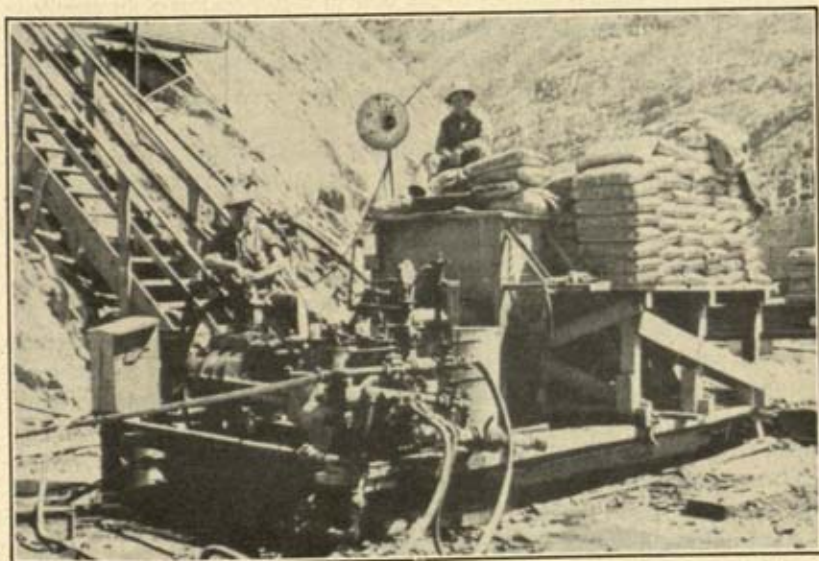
Air-driven grout pumps on the Davis Dam. (Gardner-Denver Co.)
